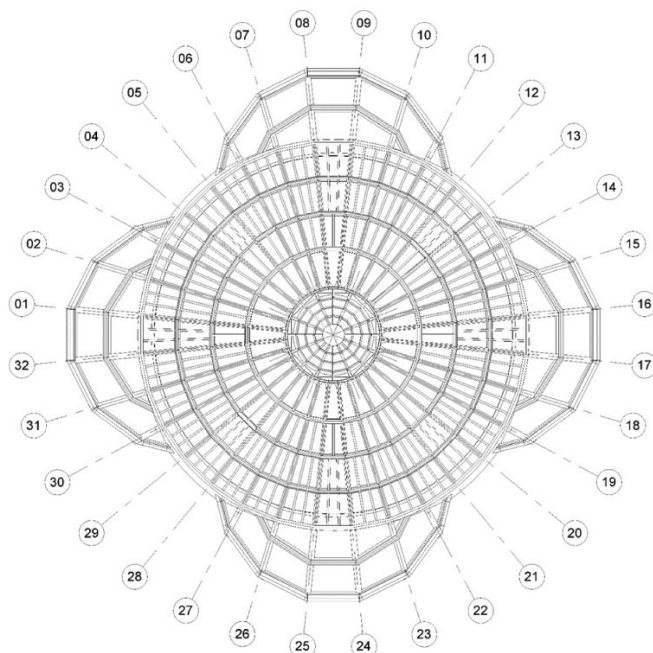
A floor plan of the structure of the Centennial Hall generated from the BIM model.
